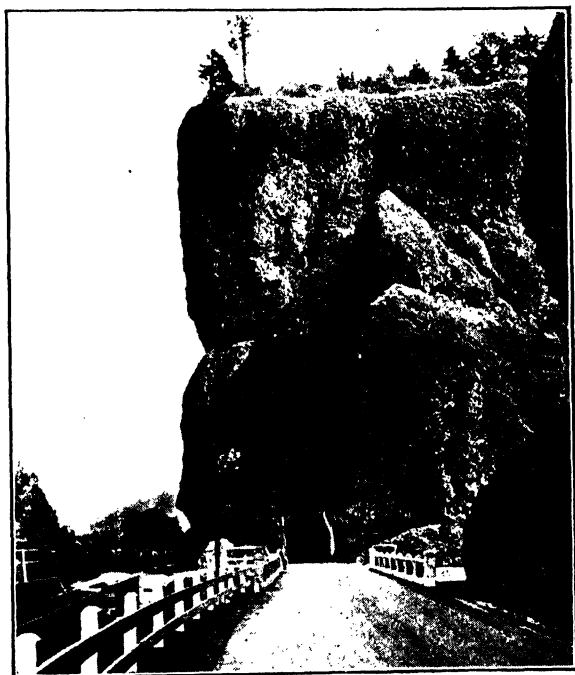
Saving excavation and preserving natural beauty by tunneling. The tunnel at Oneonta on the Columbia Highway in Oregon.
